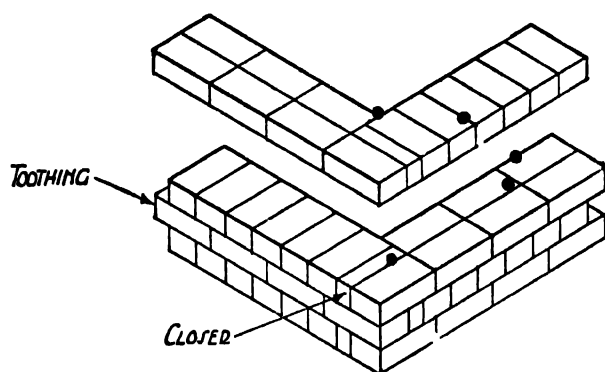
ONE BRICK WALL IN ENGLISH BOND
